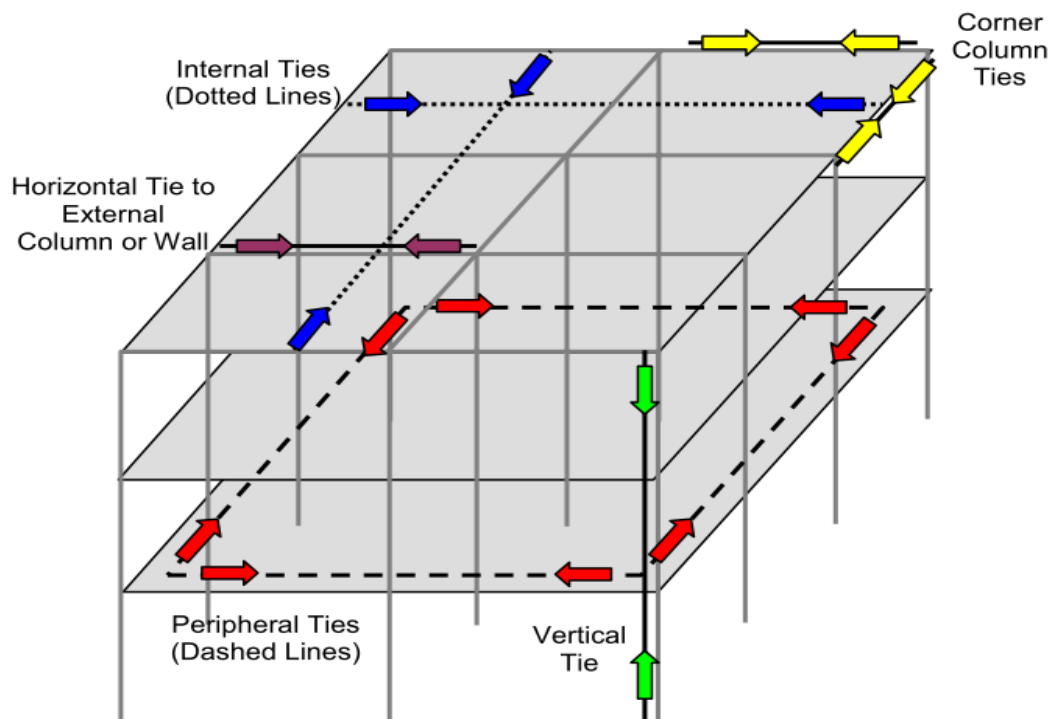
Different types of ties incorporated to provide structural integrity (Ellingwood Bruce R., 2007)
